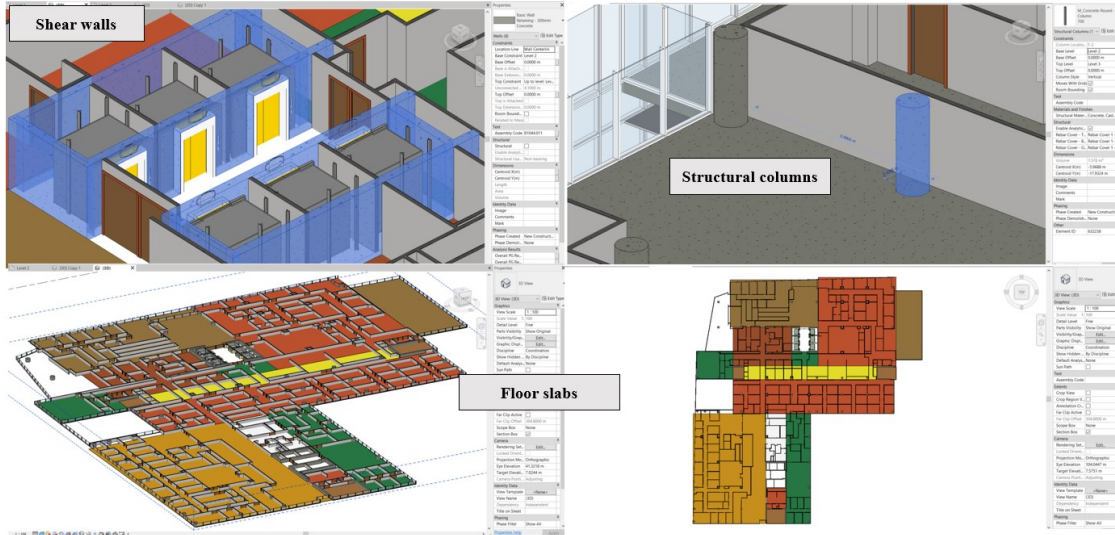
A sample of selected shear walls, structural columns and the floor slab located at the second floor of EV building
